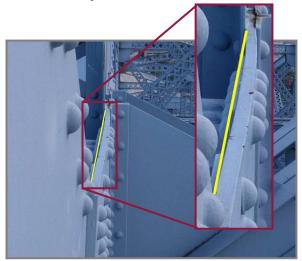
L12 southwest gusset on the North Truss with approximately 3/8" southerly bow. Note the yellow line indicating original plane of the gusset edge.
